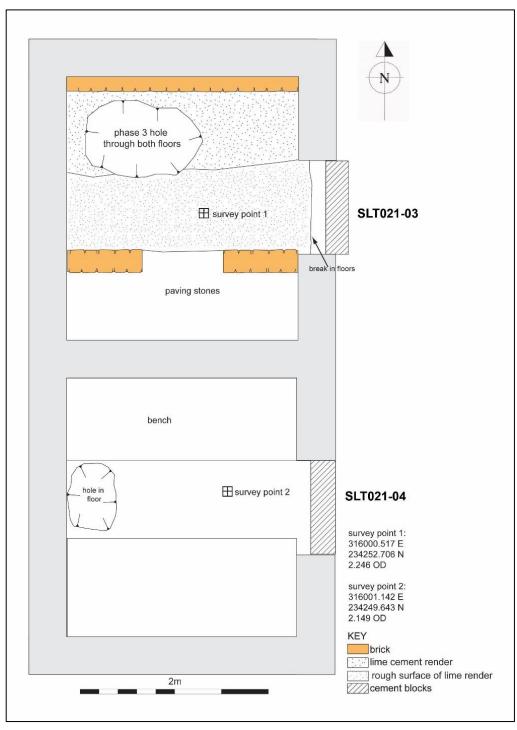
SLT021-03 and SLT021-04, typical cellar plan forms from No. 33 Westmoreland Street
